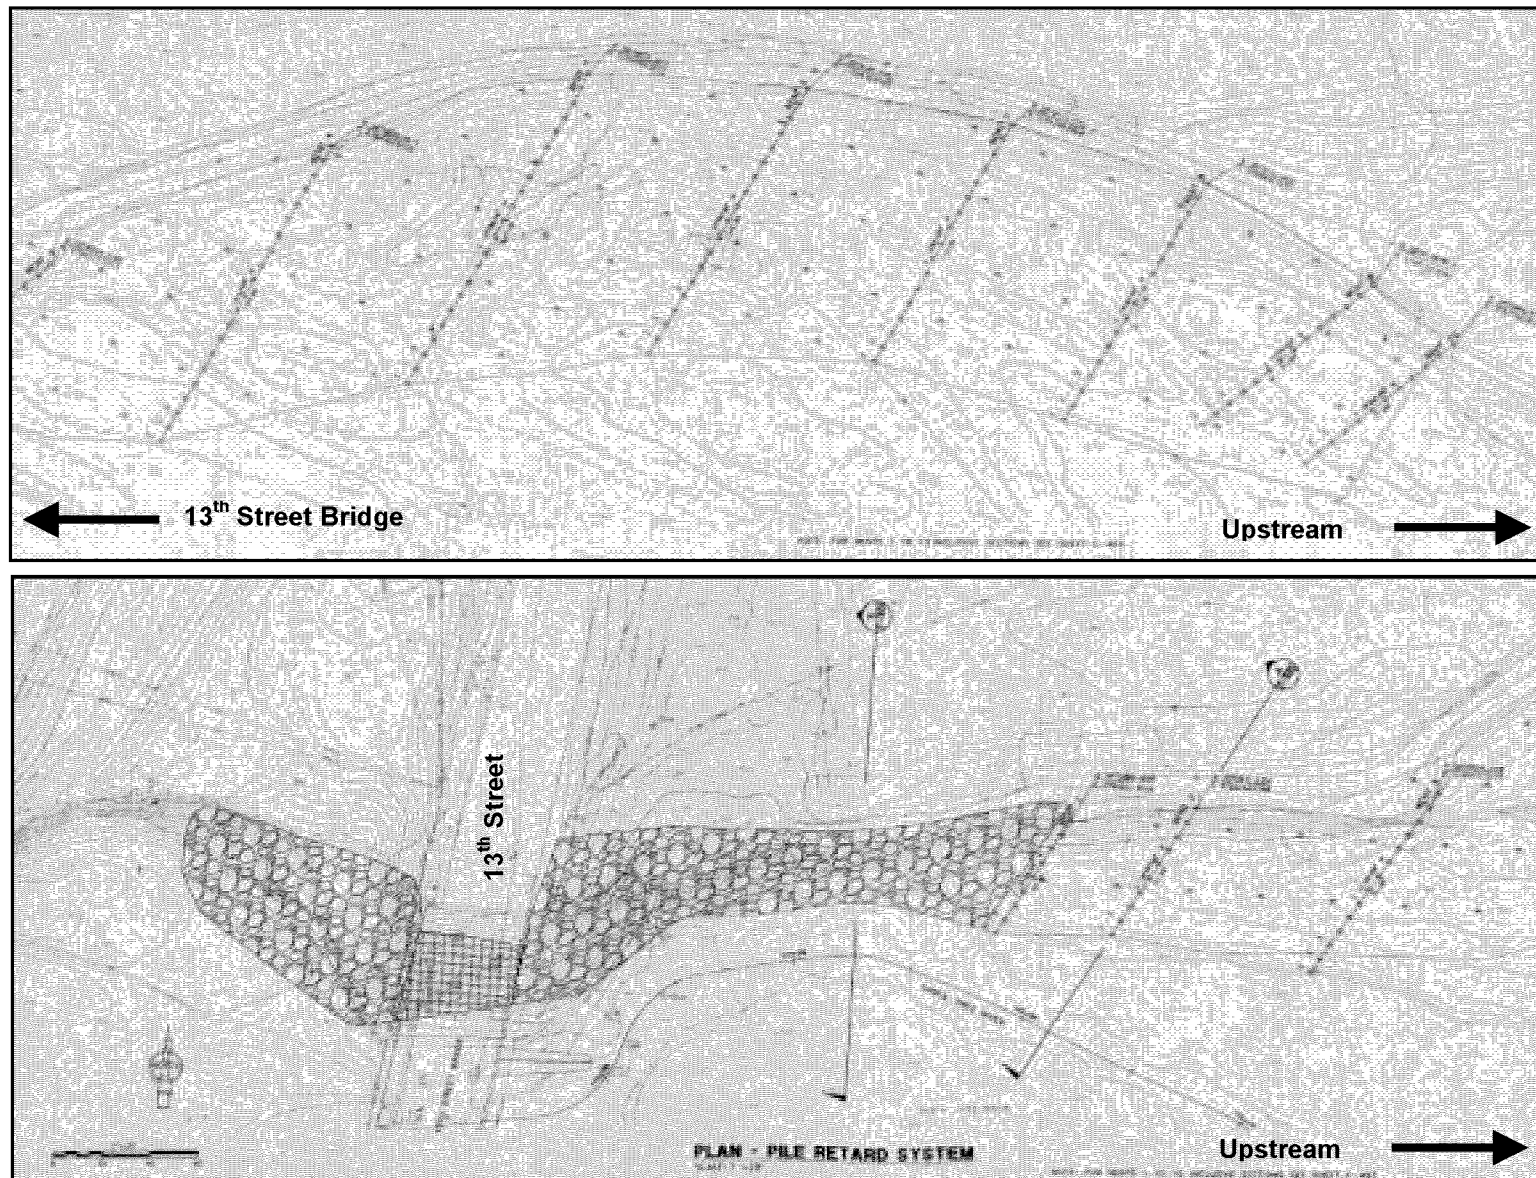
Rock riprap at northerly abutment and riverbank, and pile retard system proposed for bank protection upstream of the 13th Street Bridge at the Santa Ynez River.
